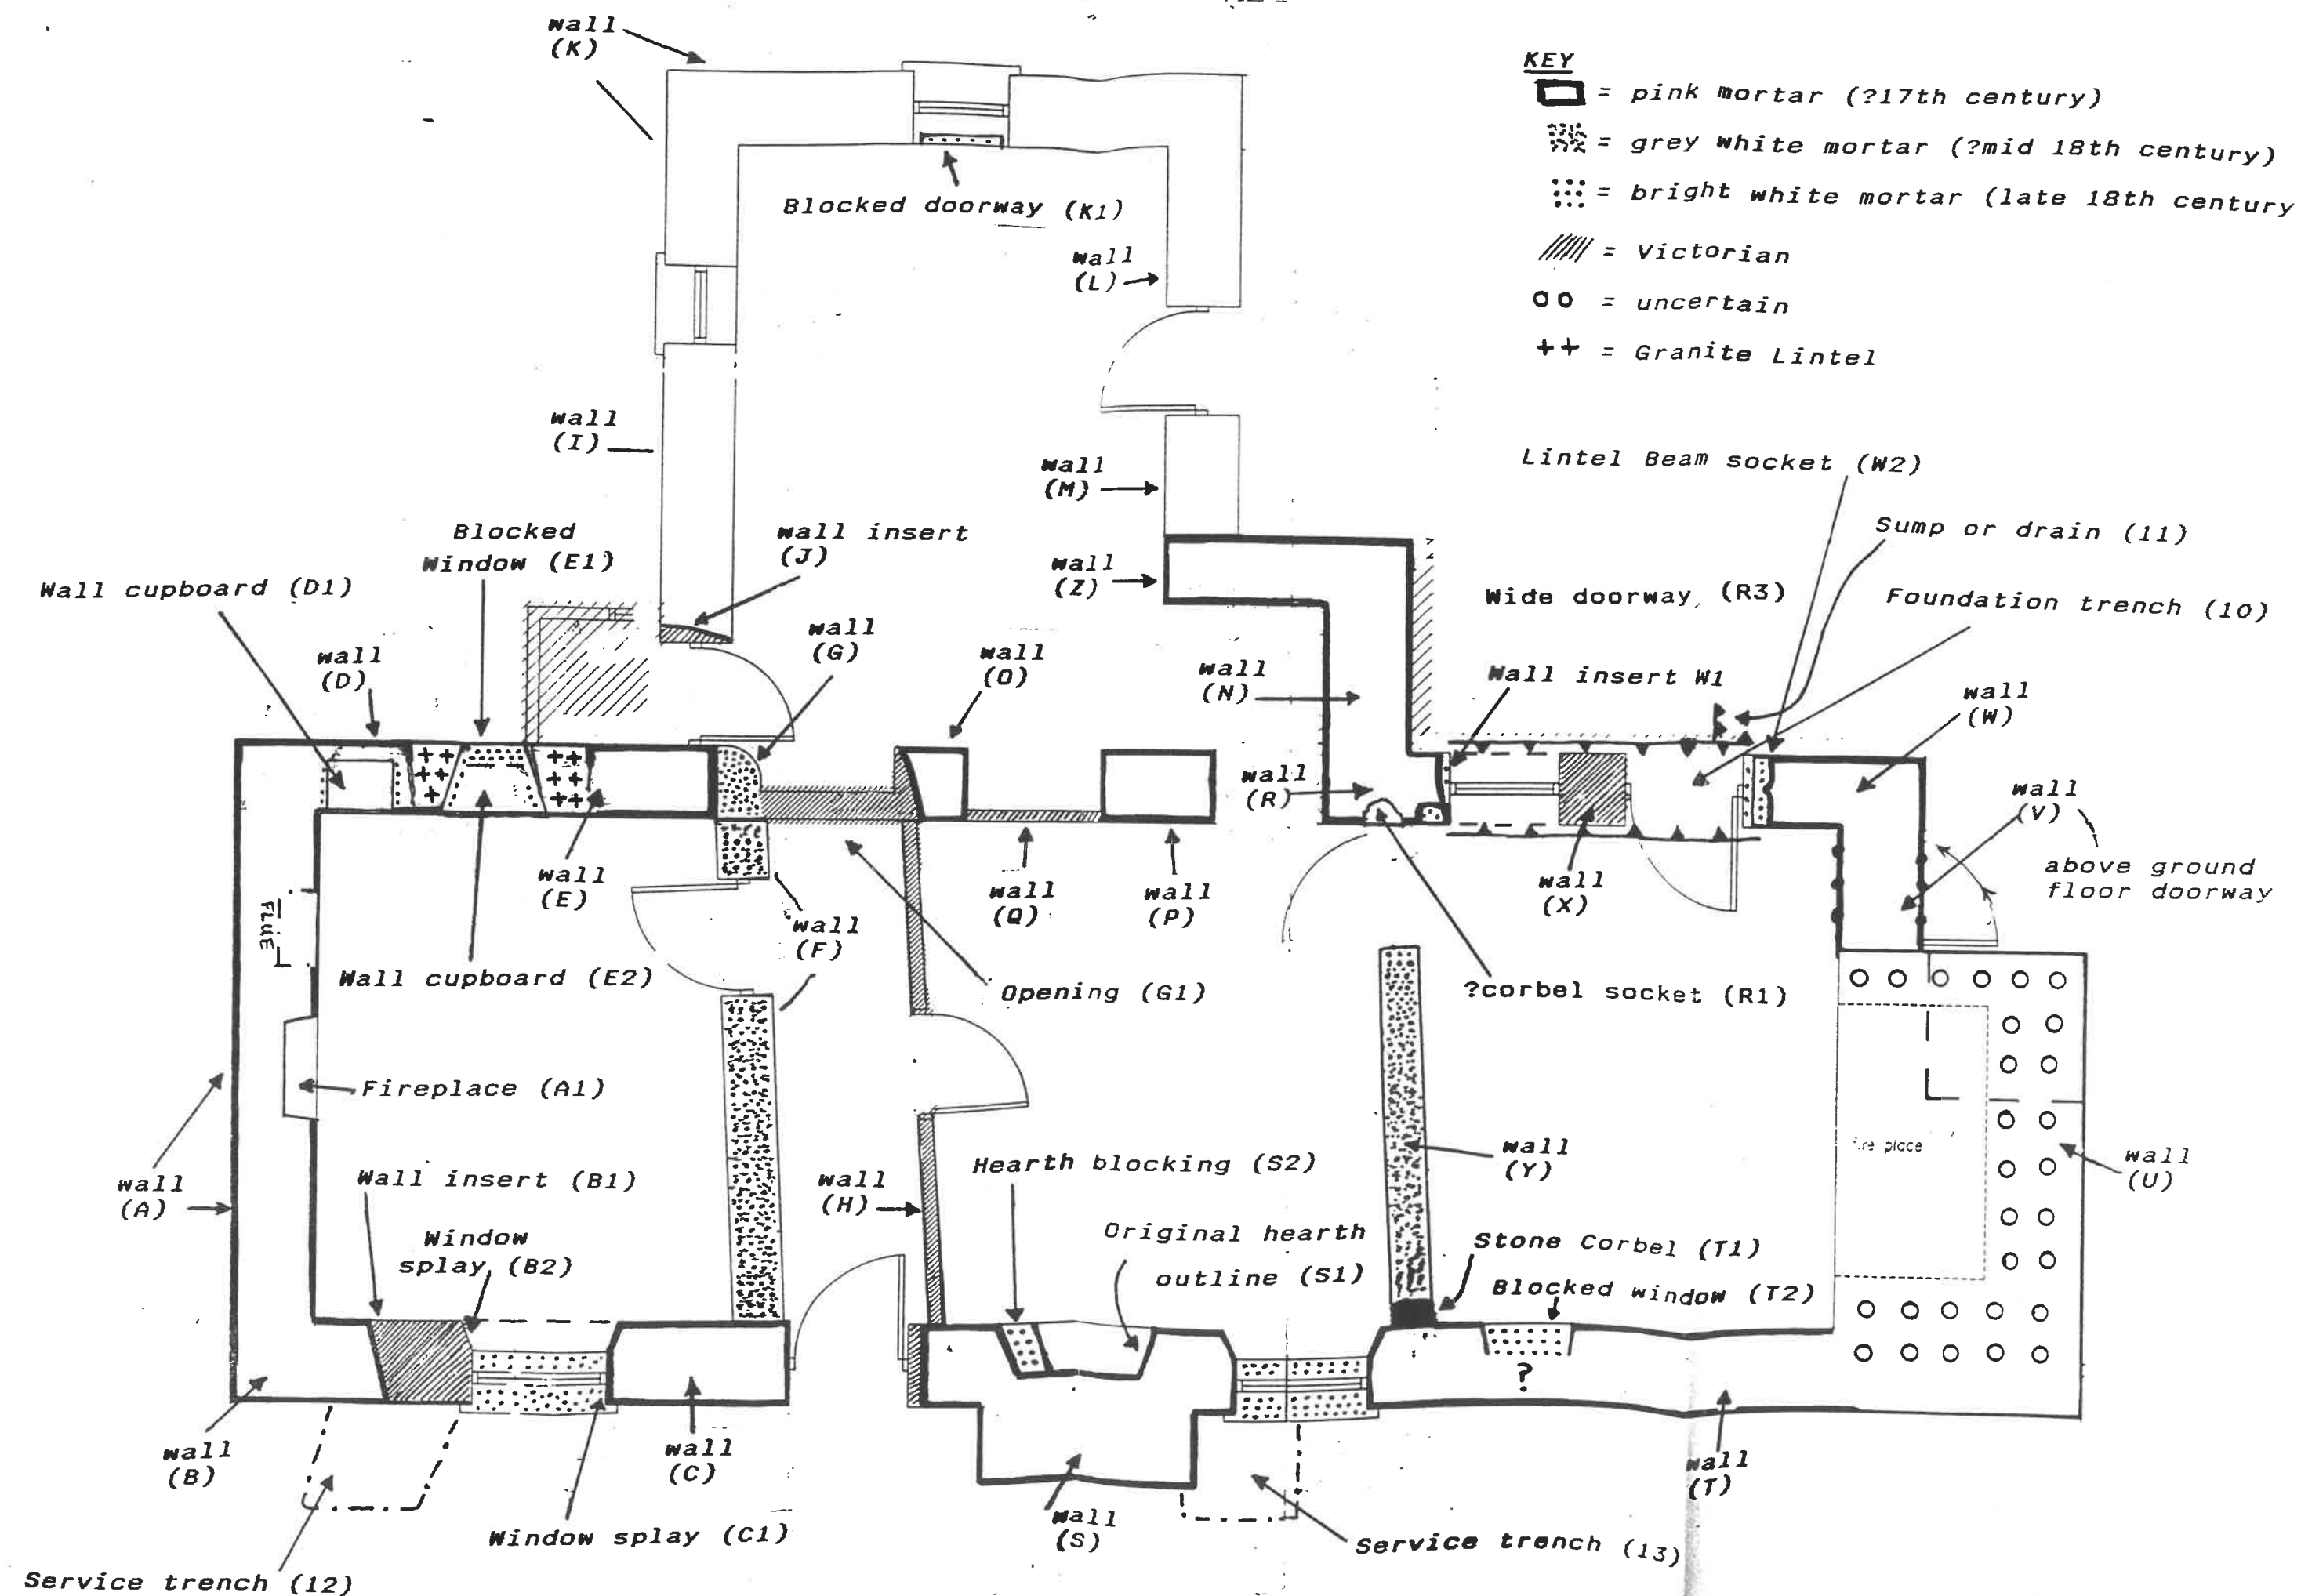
Plan of groundfloor of farmhouse showing old architectural features
